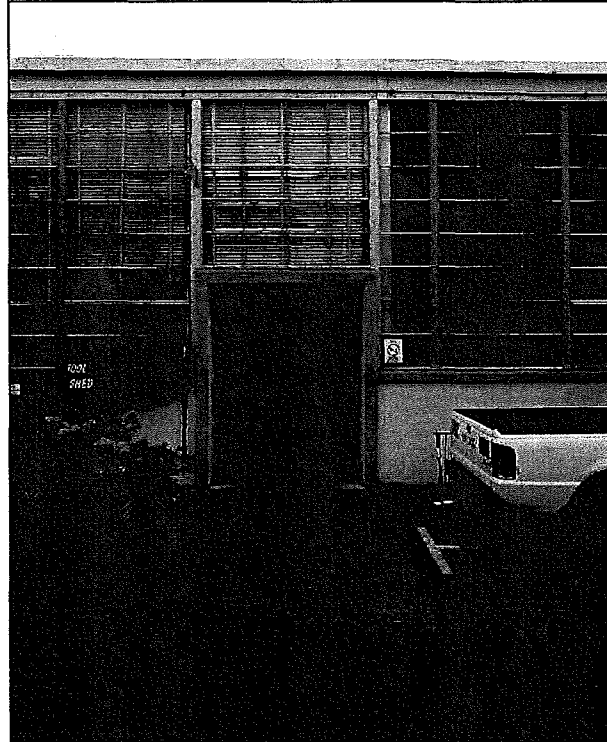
Building A, north corner, camera facing southeast, August 20, 2014.
